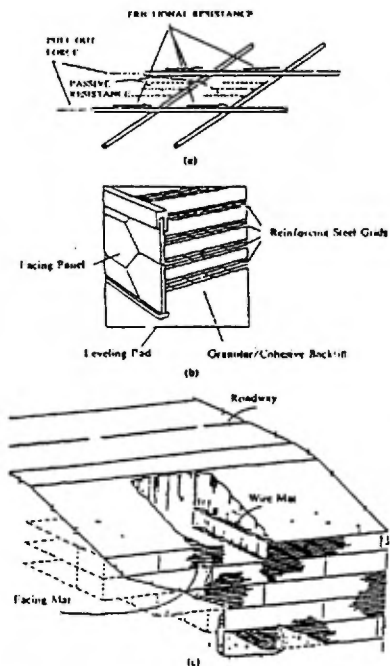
Welded steel bar mesh, steel grids reinforcement with concrete facing and welded wire wall.
